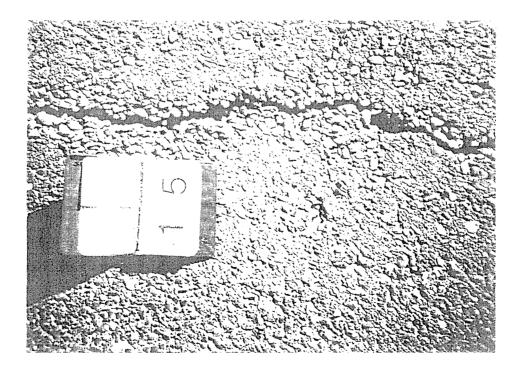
Crack of Photo 3.15 After Sandblasting
